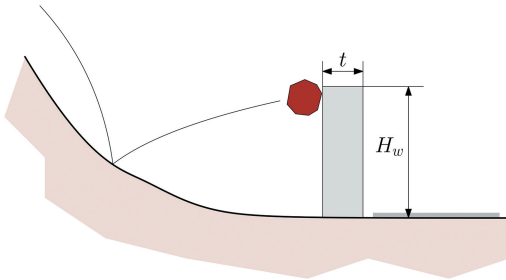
Sketch of the structure analysed in the example: a wall protecting a road from falling rocks.
